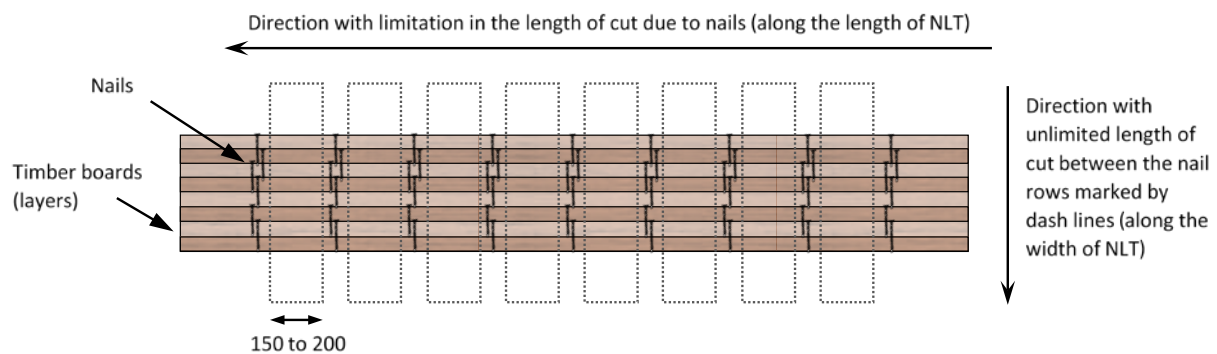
The plan view of a part of an NLT panel with multiple nail rows (measurements are in mm).
